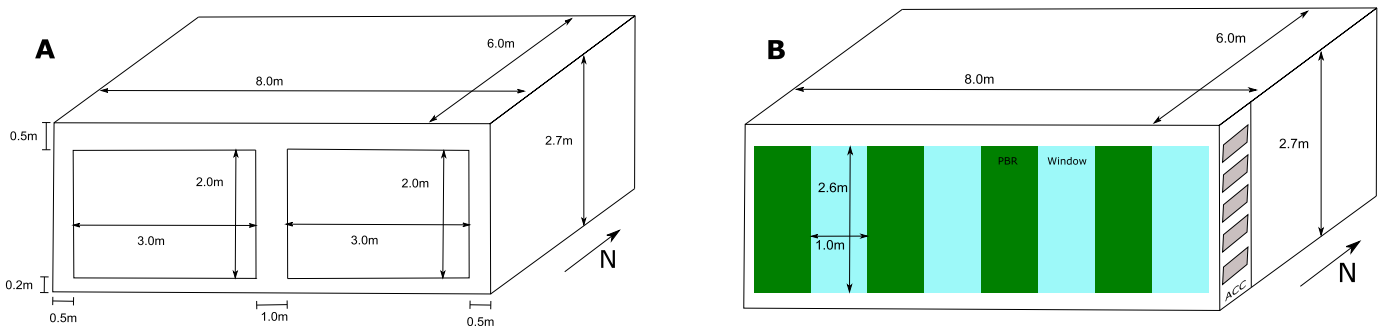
A) Standard 140 case 600 and case 900; B) Standard building with biofacade (alternating PBRs and windows) on south wall.
